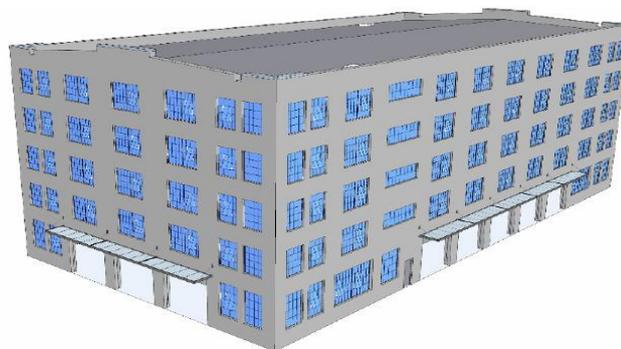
Illustration of a building with a soft ground story due to large openings and narrow piers.
